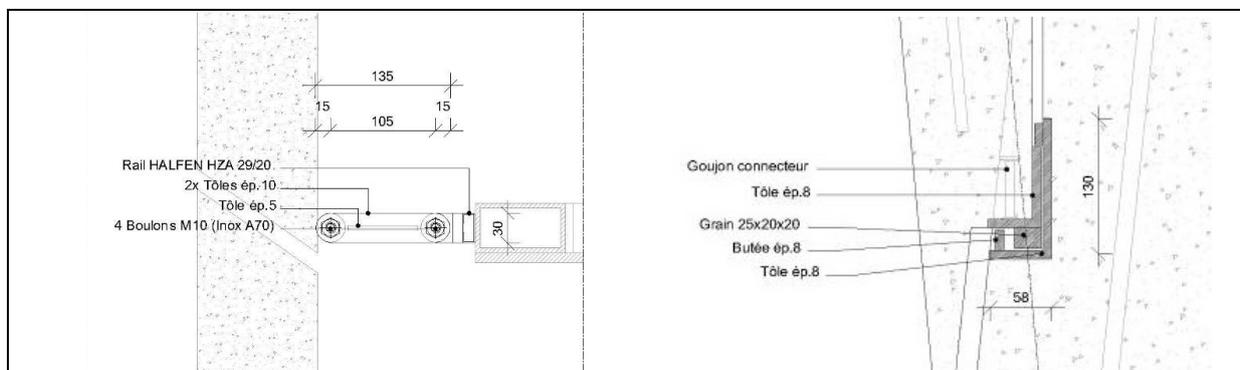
Hinges between pieces [Drawings C&E Ingénierie]
